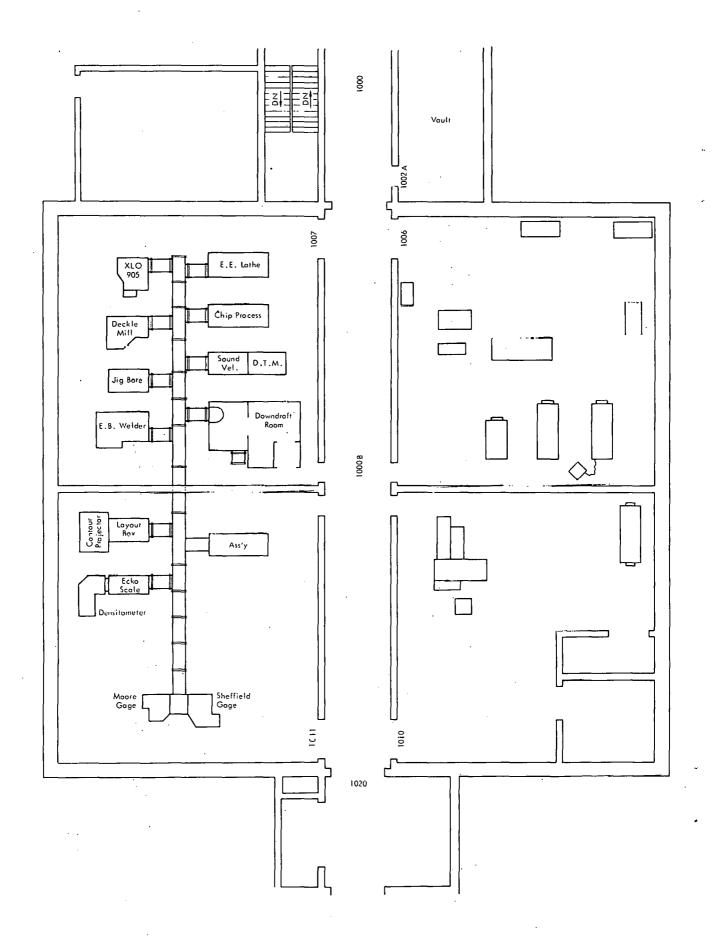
Equipment layout floor plan, Bldg. 332 Incr. III.
